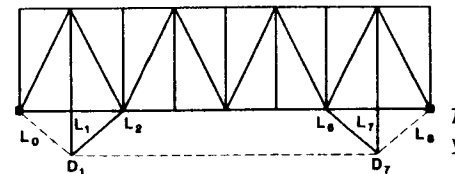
Statically Determinate Symmetrical Truss One Posttensioned by External Two-Drape Cable Layout
